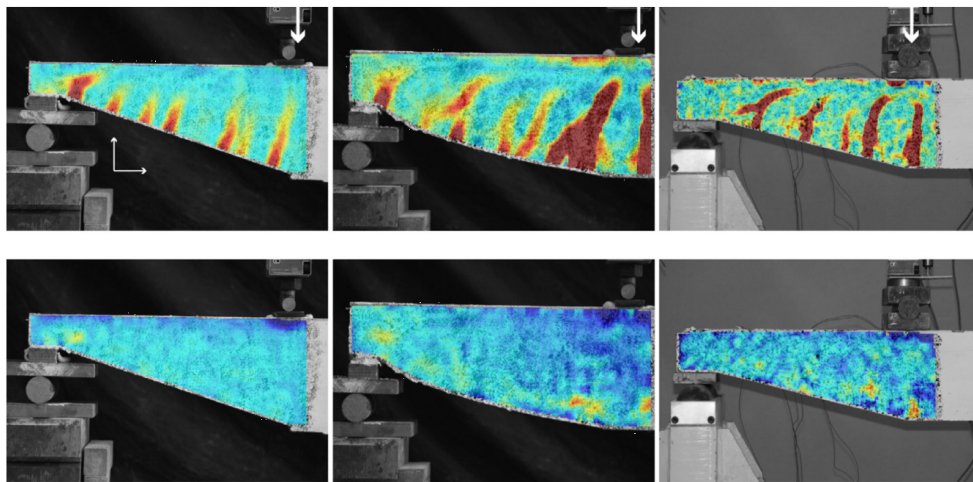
Reinforced concrete gable beams fail in shallow-depth areas.
